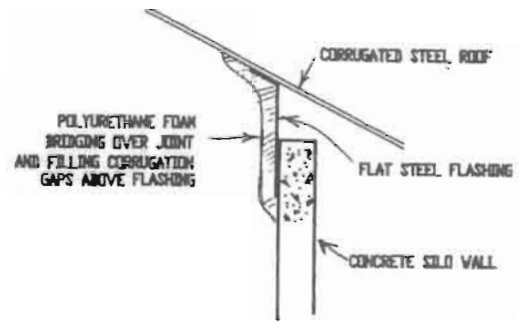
This figure illustrates the application of polyurethane foam for sealing the joint between the concrete wall and corrugated steel roof of a squat silo.
